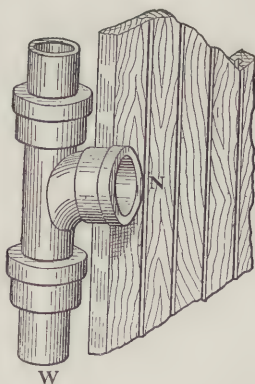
SINK OR LAVATORY CONNECTION WITH HUB OF CAST PIPE PROTRUDING THROUGH WAINSCOTING—WASTE STACK CONCEALED IN PARTITION WALL
